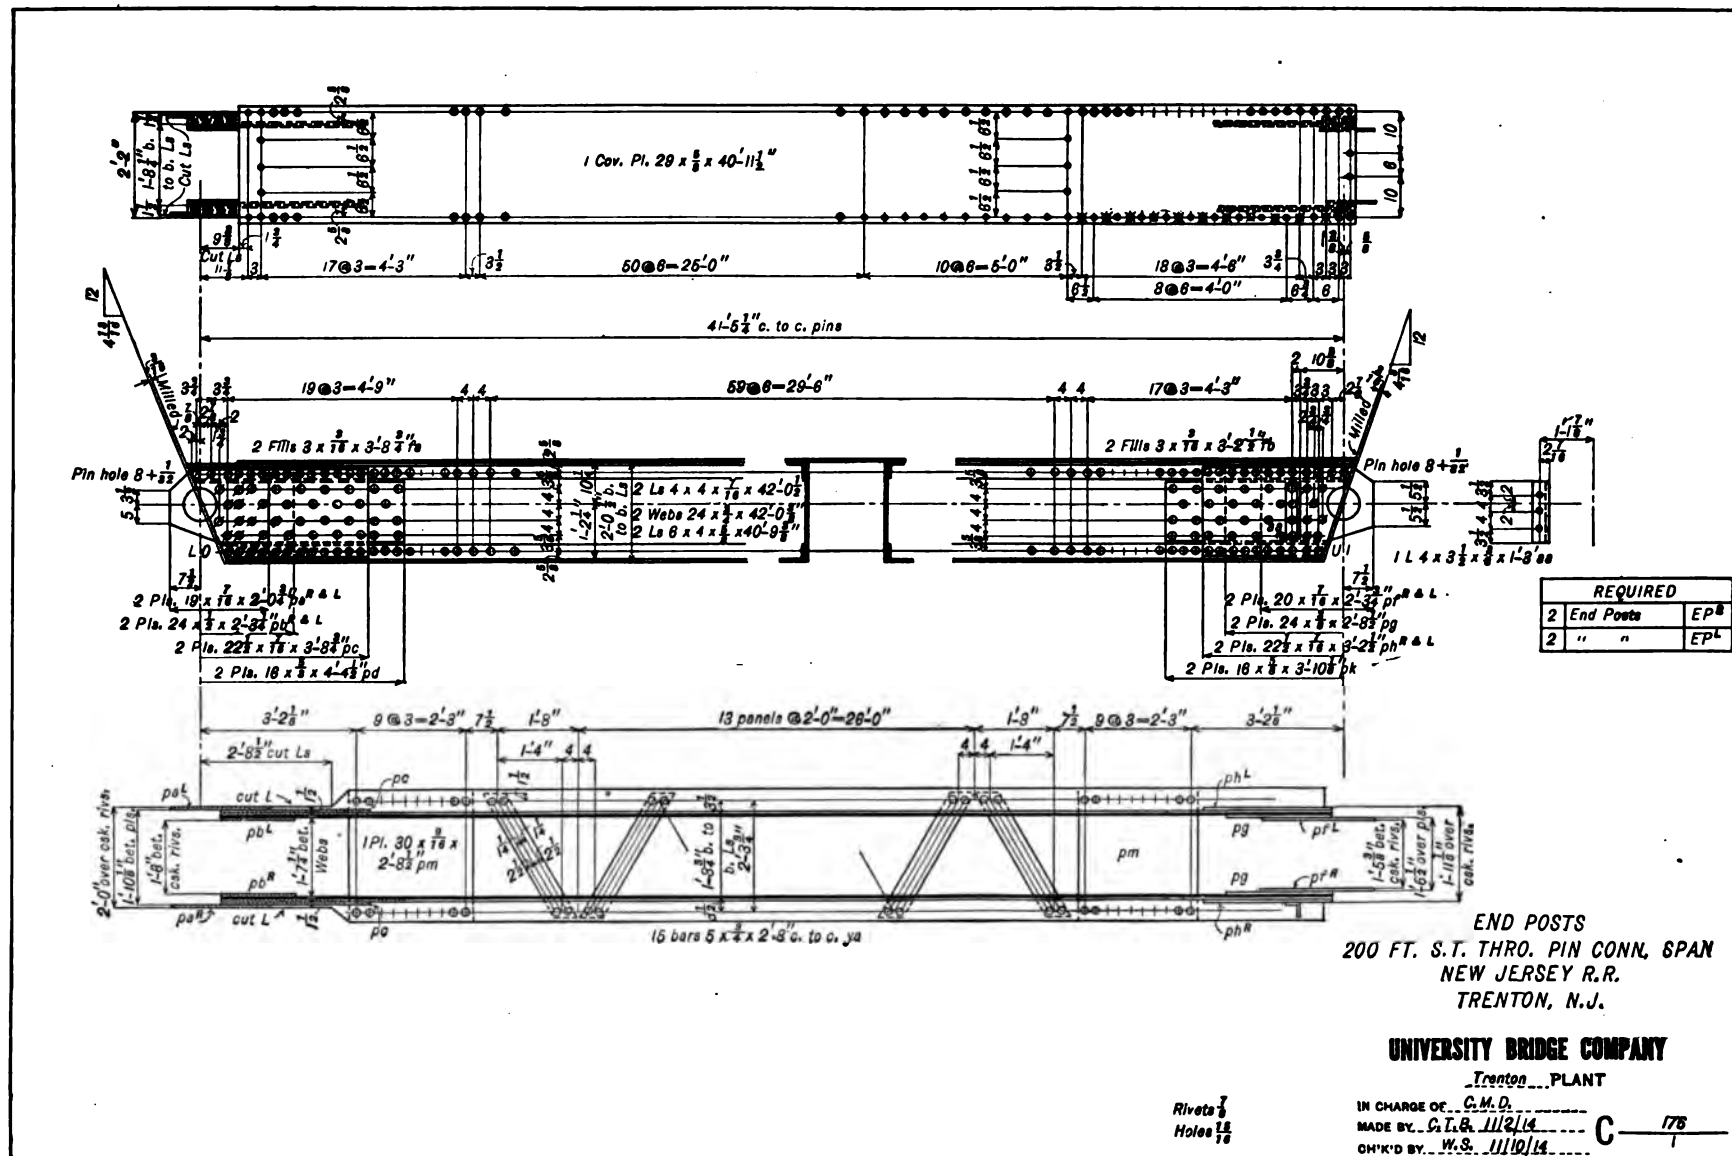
End Post for Pin-connected Truss Shown on Next Page.
